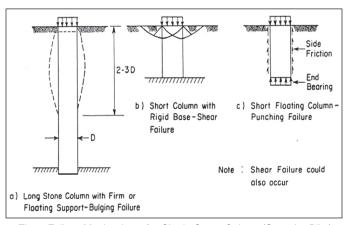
Failure Mechanisms for Single Stone Column/Granular Pile/ Granular Pile
